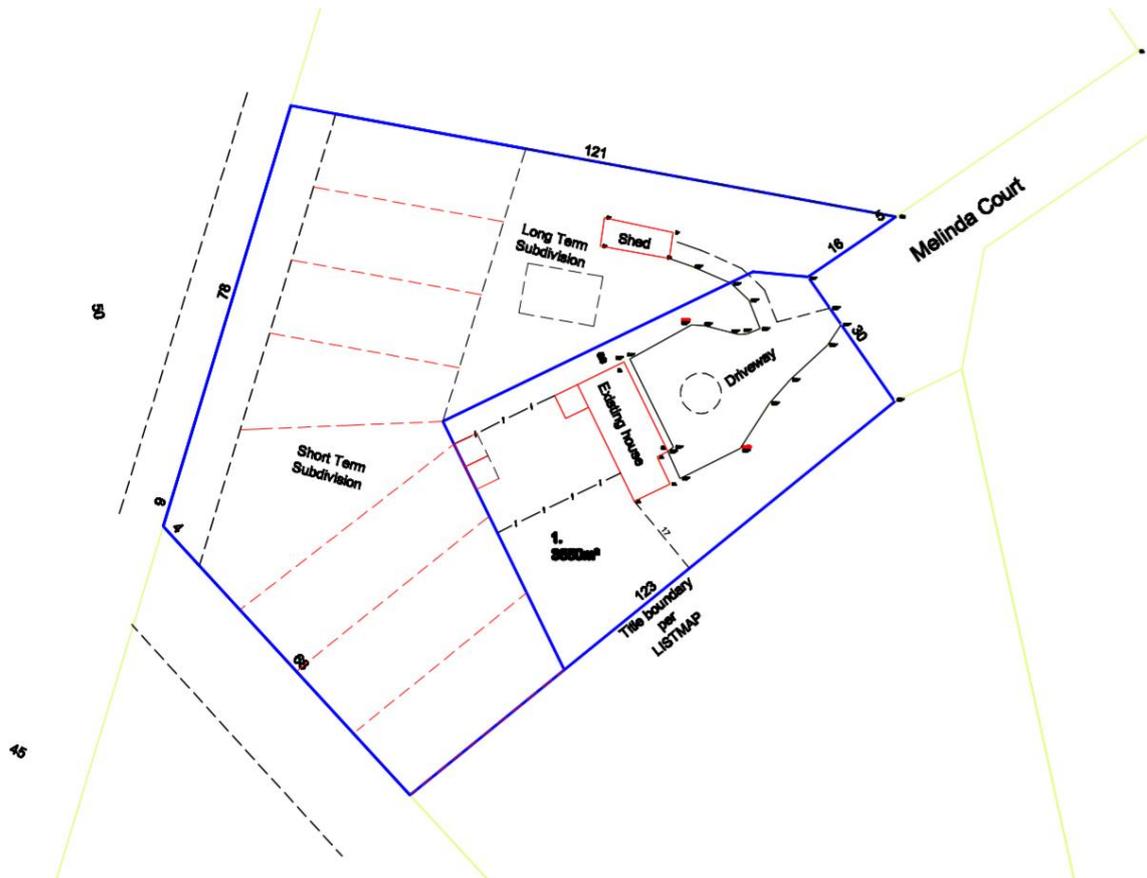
Potential plan of subdivision for 9 Melinda Court.
